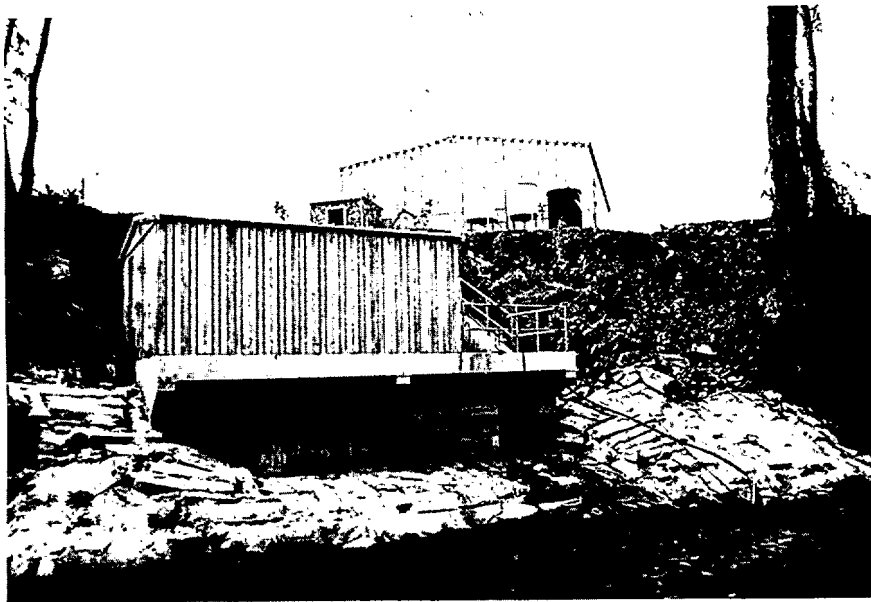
Maltbie Street Site Location. Pumping Station in Foreground, Overflow Screening Building in Background.
